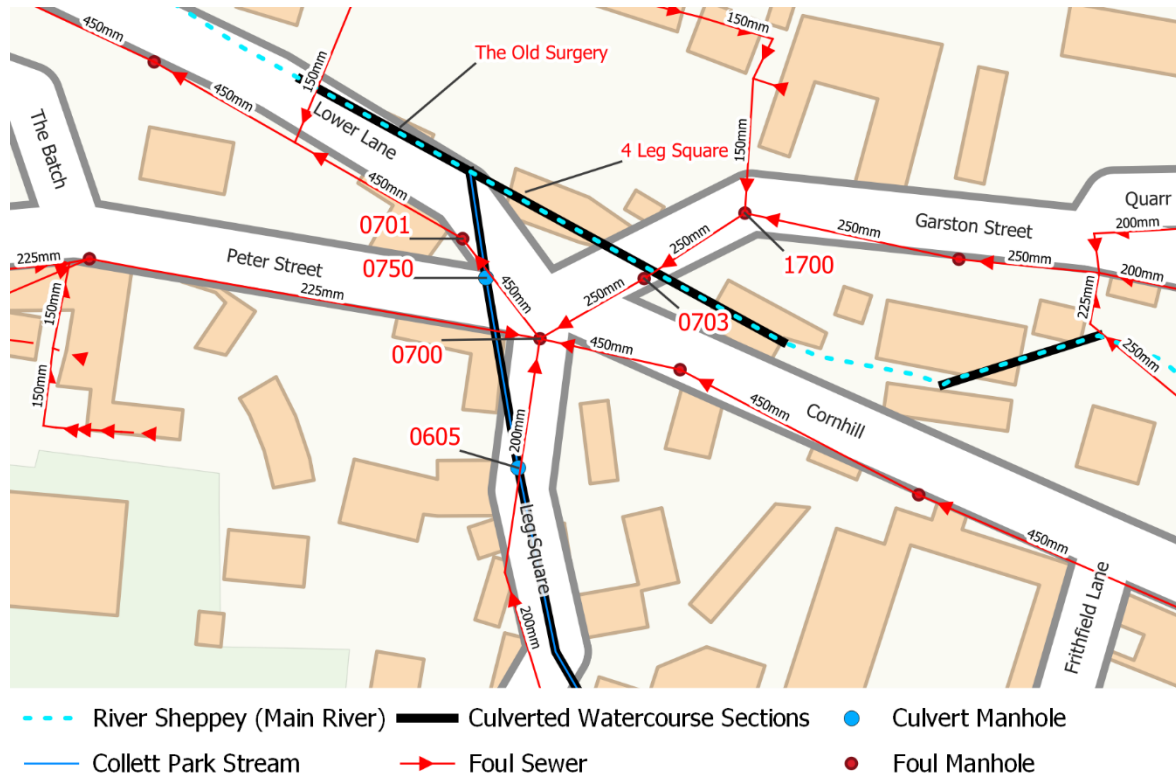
Surcharging from Collett Park Stream culvert (manhole ref: 0750)
